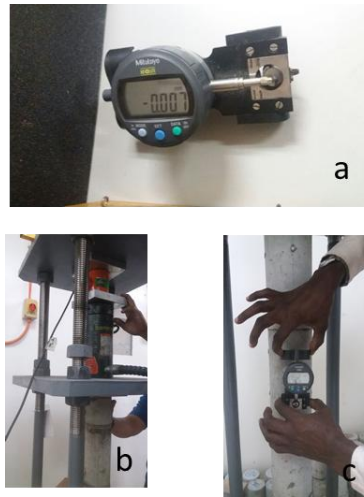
(a) Demec strain gauge (b) Hydraulic jack, load cell positioned to induce predetermine load intensity on concrete sample (c) Creep strain reading using the Demec gauge
